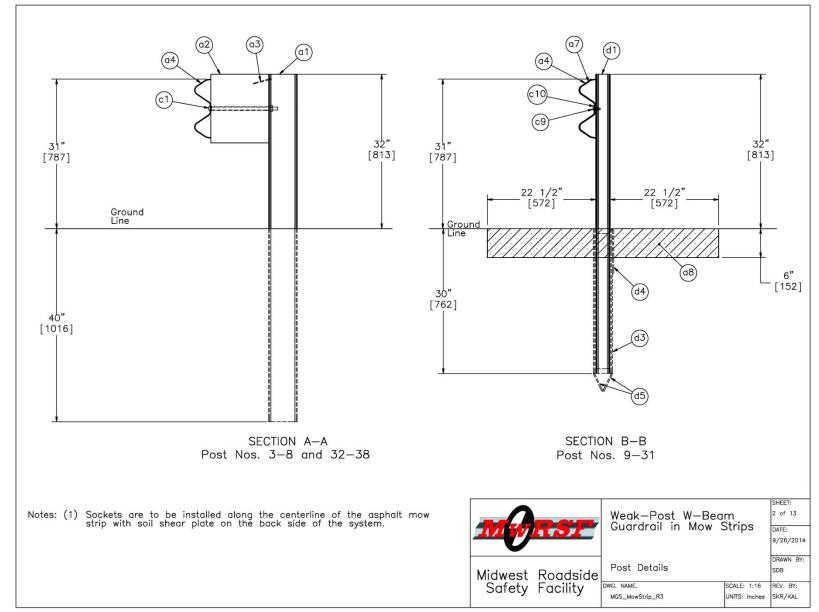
Guardrail Post Details, Test No. MGSMS-1
